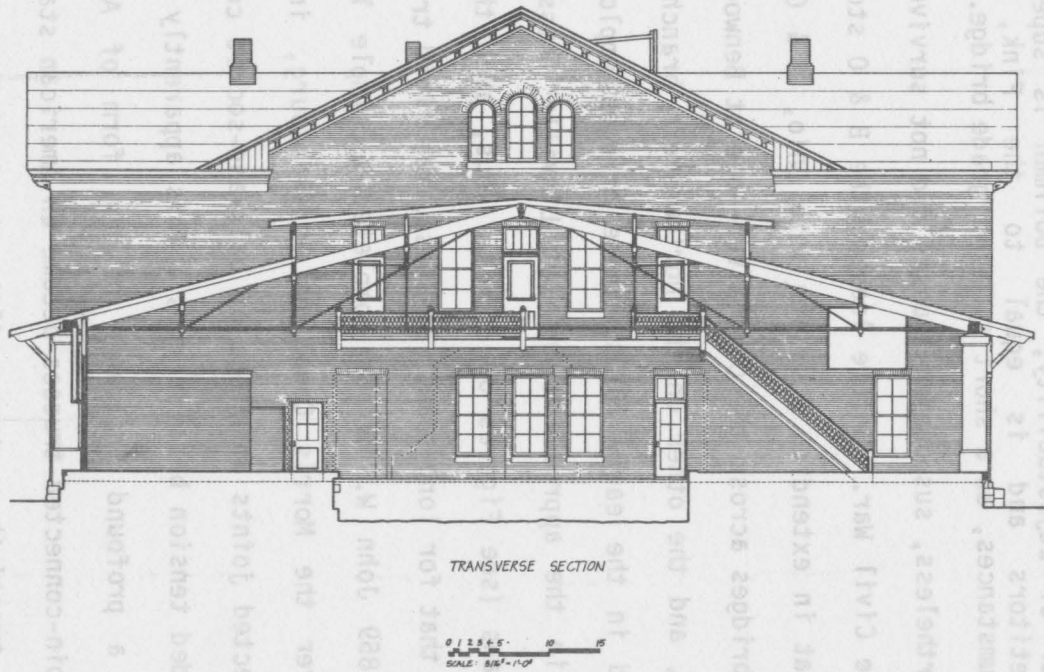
Fink Roof Truss at Wheeling - H.A.E.R. W.V. Survey
